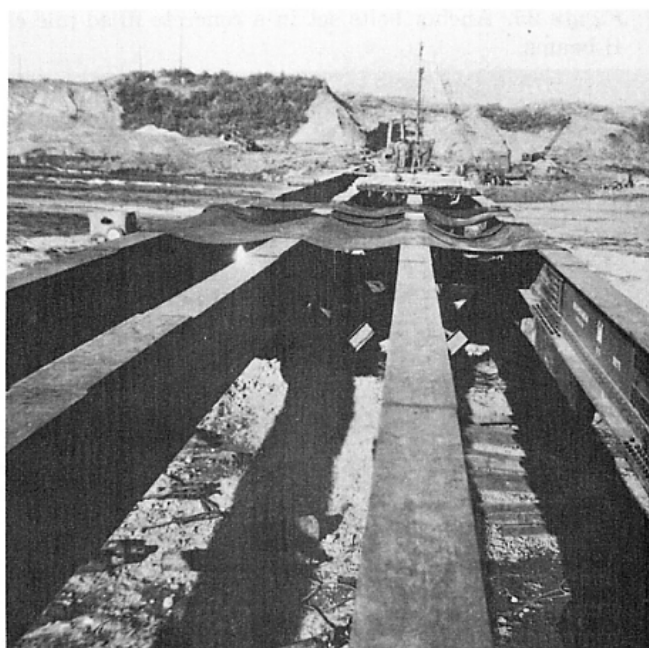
Thirty-six-inch I-beams in place on bridge with a pile driver, in background, working on one of the northernmost piers.
